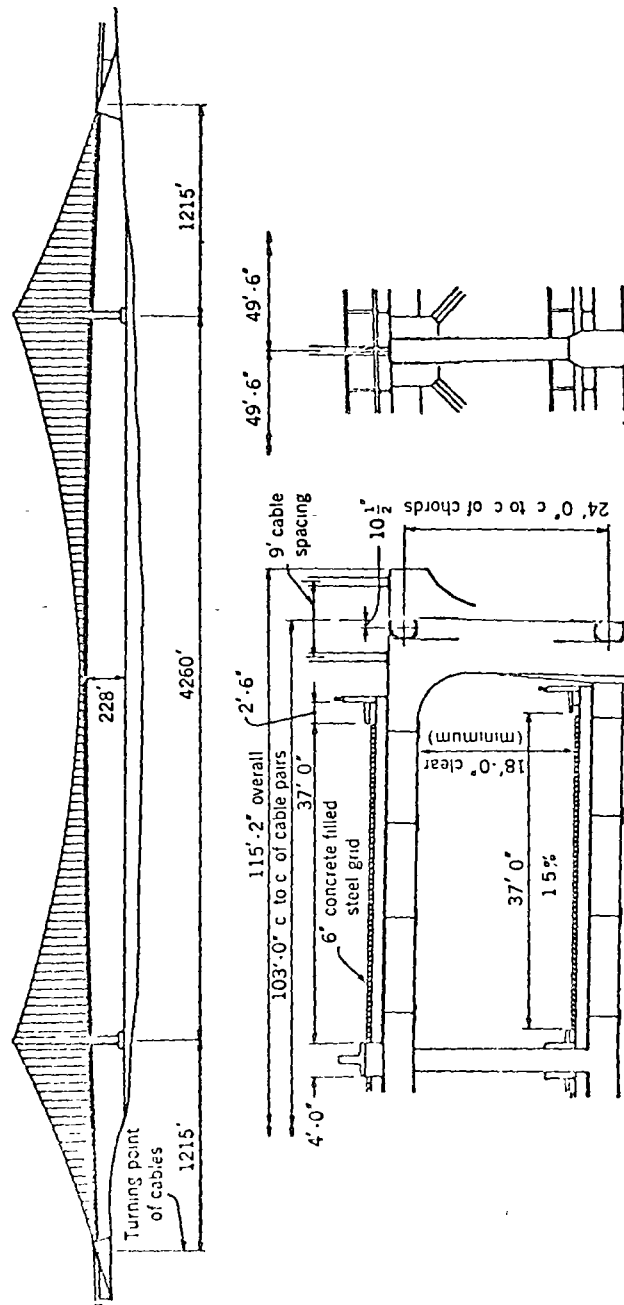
Verrazano Narrows Bridge: general arrangement and deck.
